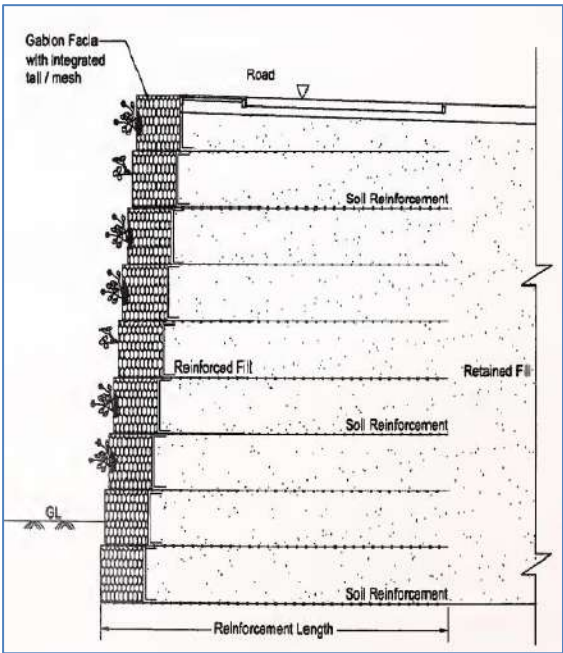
Typical Cross Section of RS Wall with Gabion Facia with Integrated Tail
